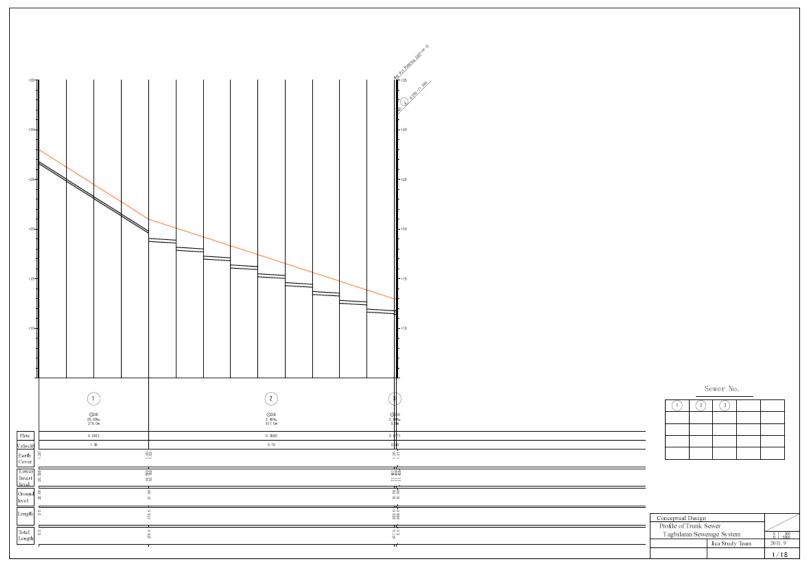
Profile of Trunk Sewer (Tagbilaran Sewerage System)
